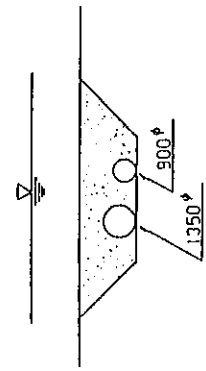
PLAN AND SECTION OF OCEAN OUTFALL
